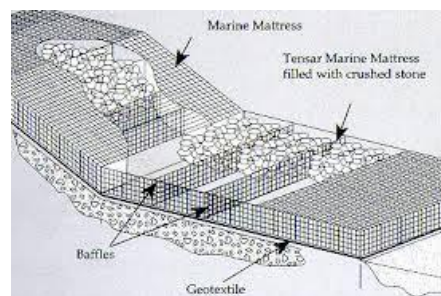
& 25 – Accepted general outflow structure erosion protection systems that are implemented in practice.
